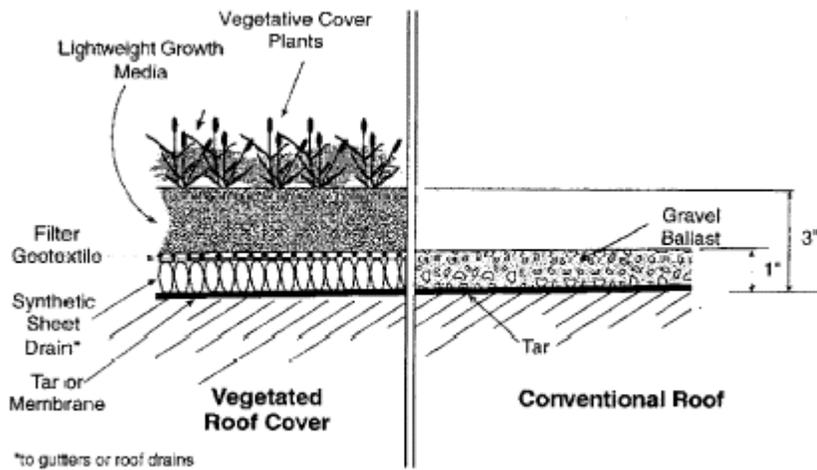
Example Vegetated Rooftop Cross-Section
